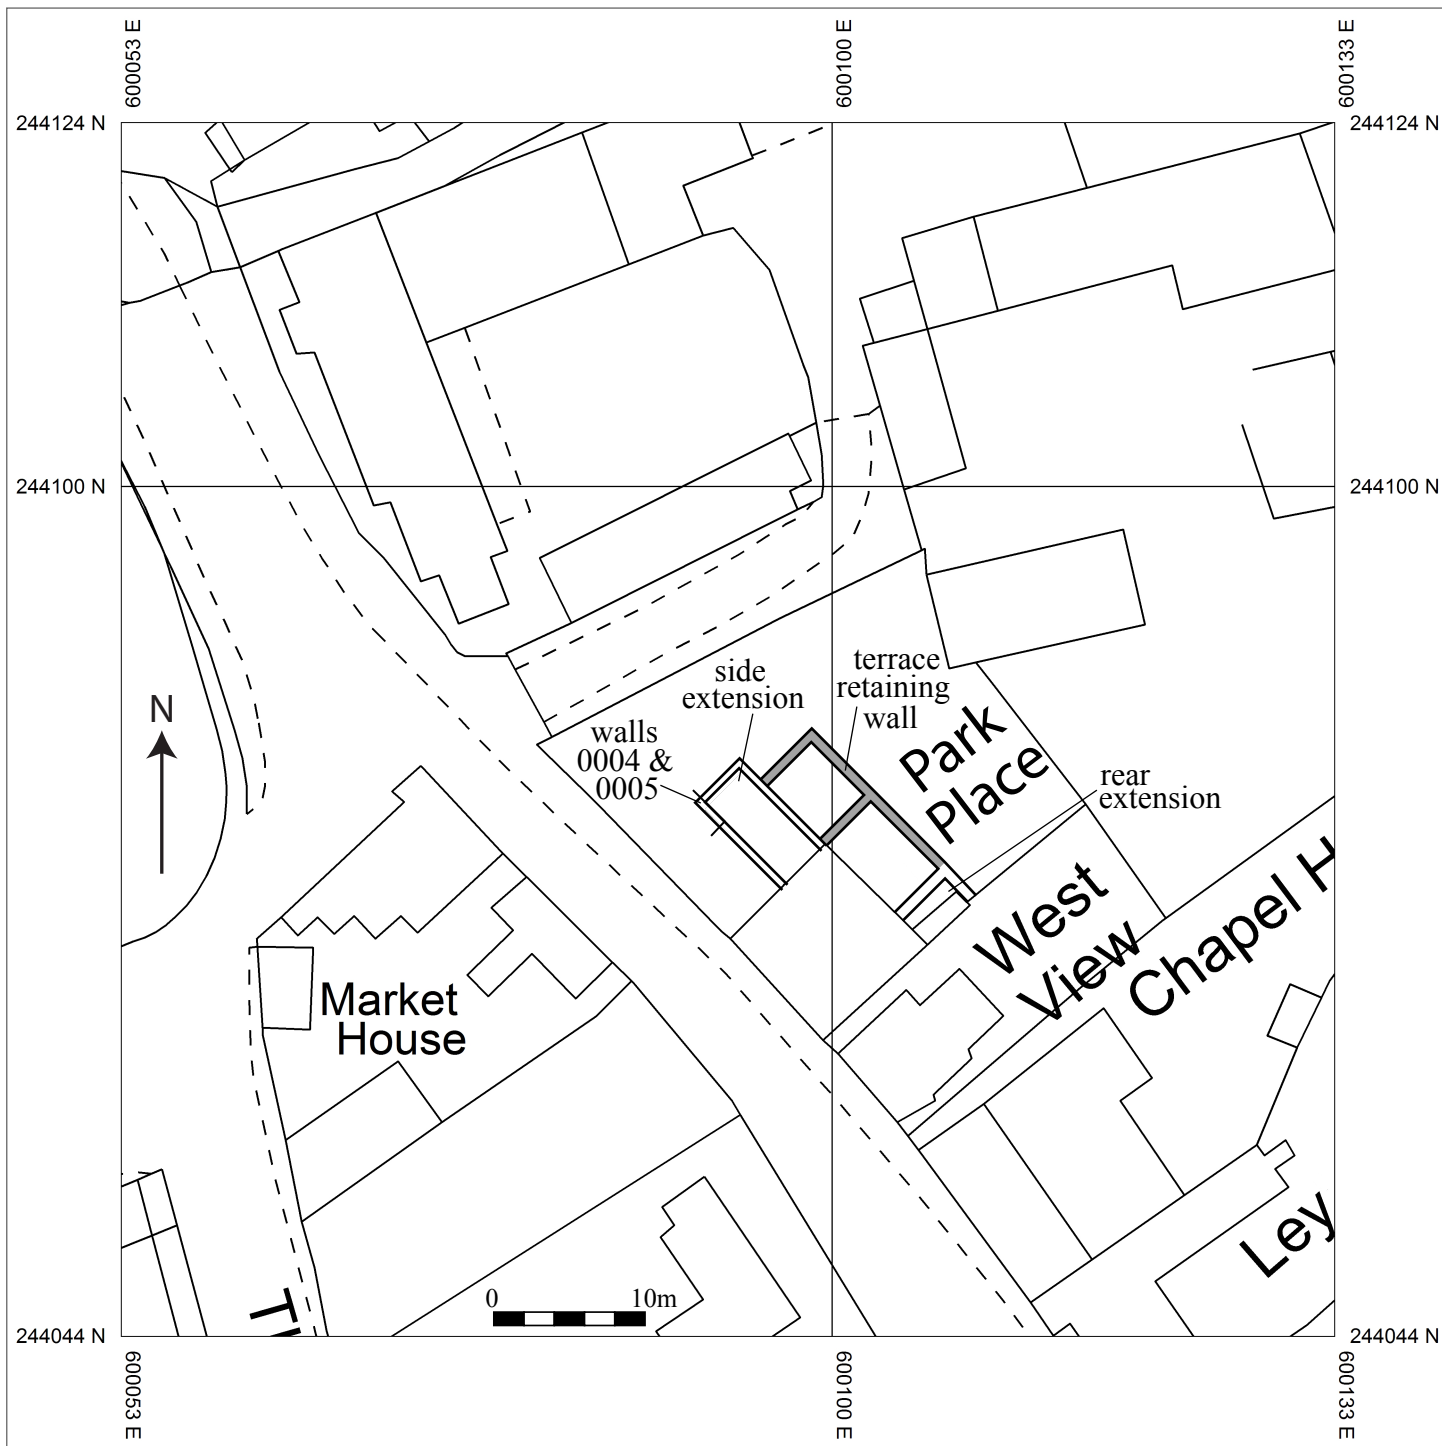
Monitored foundation trenches for extensions and terrace retaining walls.
